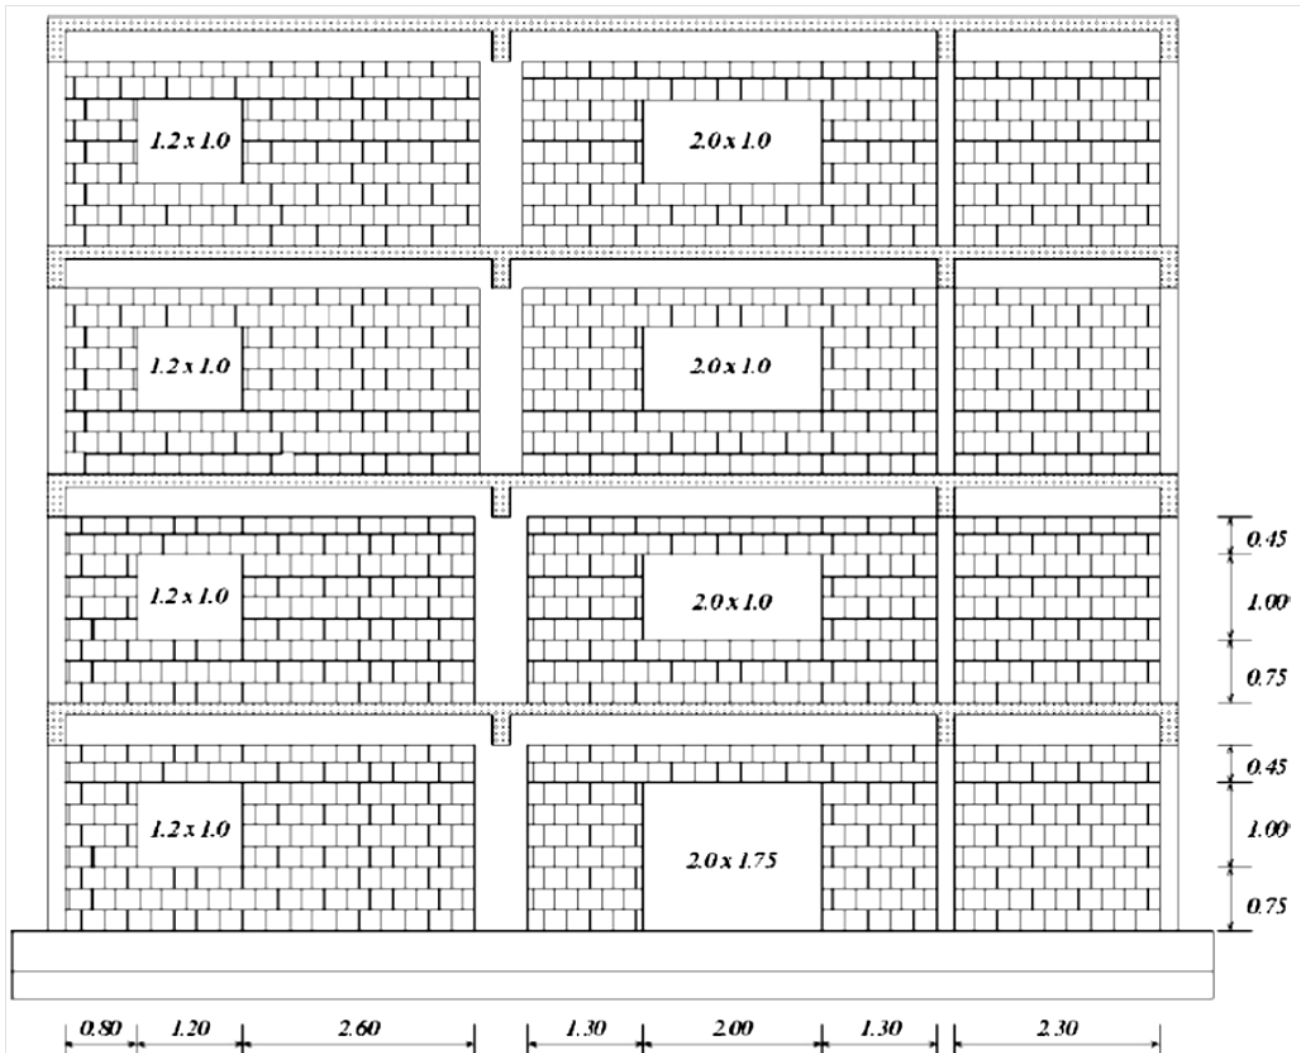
, Elevation view of the infilled frame with location and dimensions (in m) of openings
